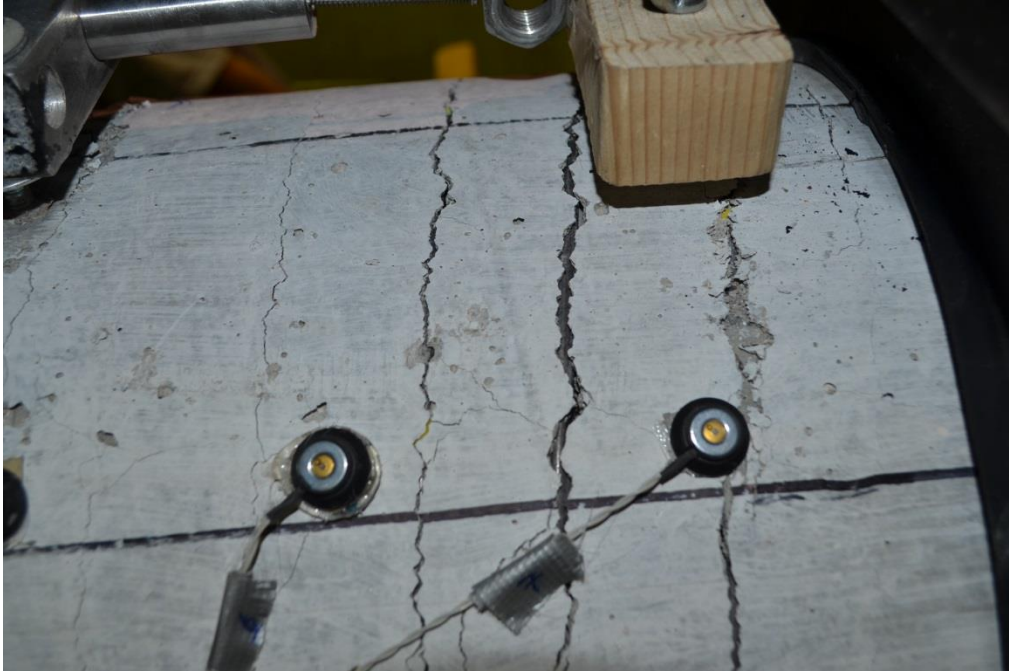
Close-Up View of Flexural Cracks in Specimen H2C3-C after Failure
